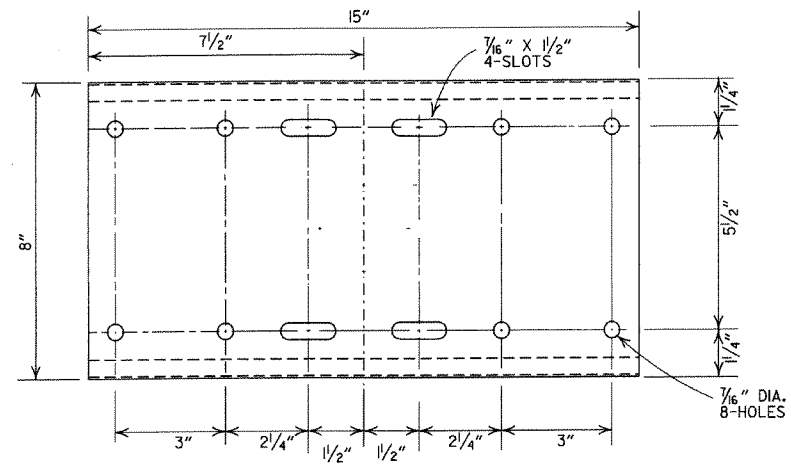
DETAIL OF TERMINAL ANCHOR POST (TYPE I)
